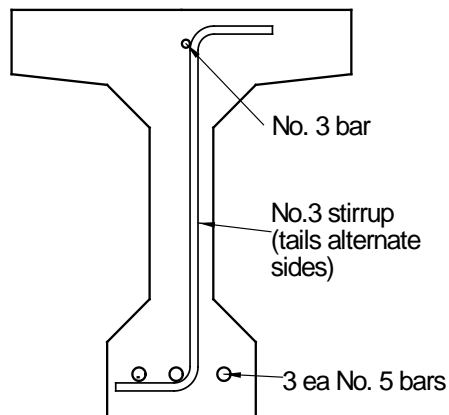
Cross-section of Specimen 1 Steel Reinforcement
